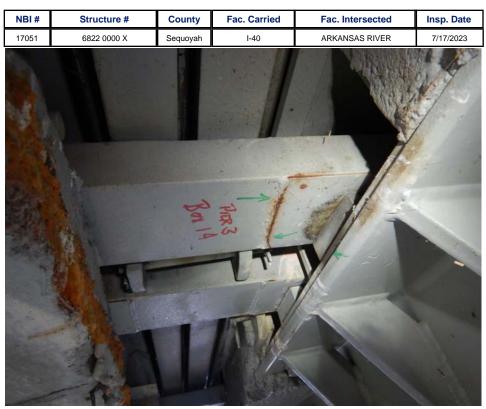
Looking east at the underside of the pier 3 modular joint at support box 5. Note: bearing block for support bar 1 is missing at the east support box. Stainless steel sliding surface is painted (typ.).
